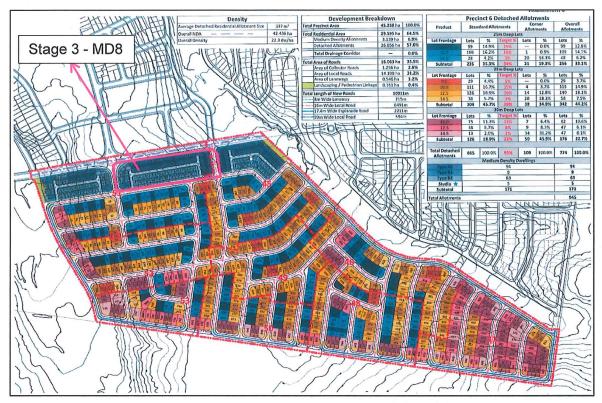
Concept Plan approved under SPP-17-00044 and the location of Stage 3 (subject site)
